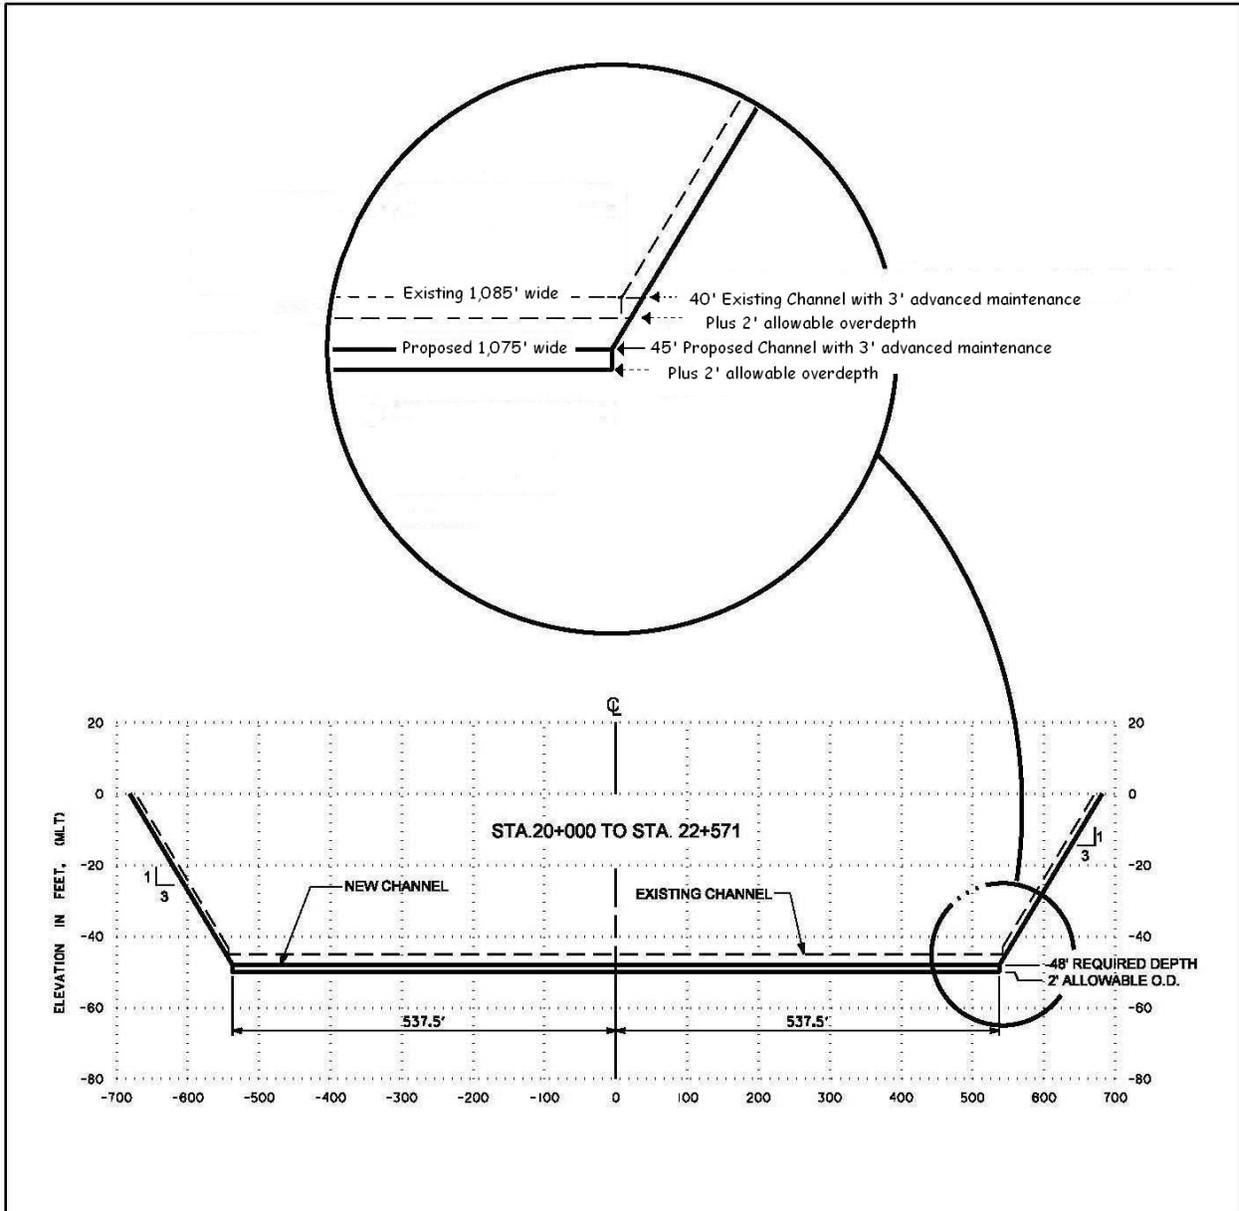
Typical Cross Section of Proposed Extension within Galveston Harbor Channel
